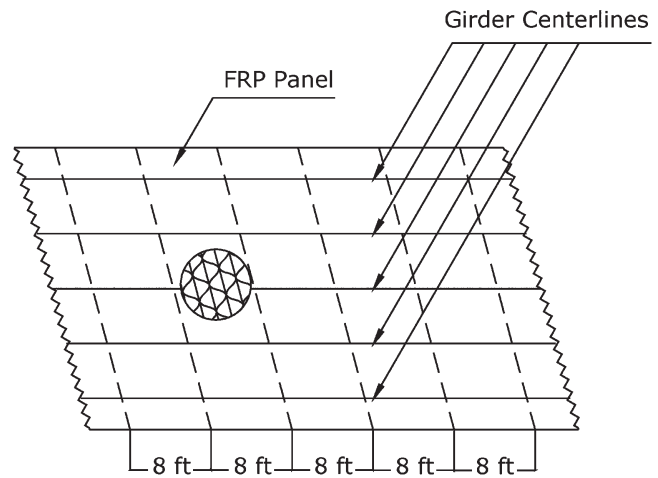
Direction of KSCI Panels with Respect to Bridge Girders
